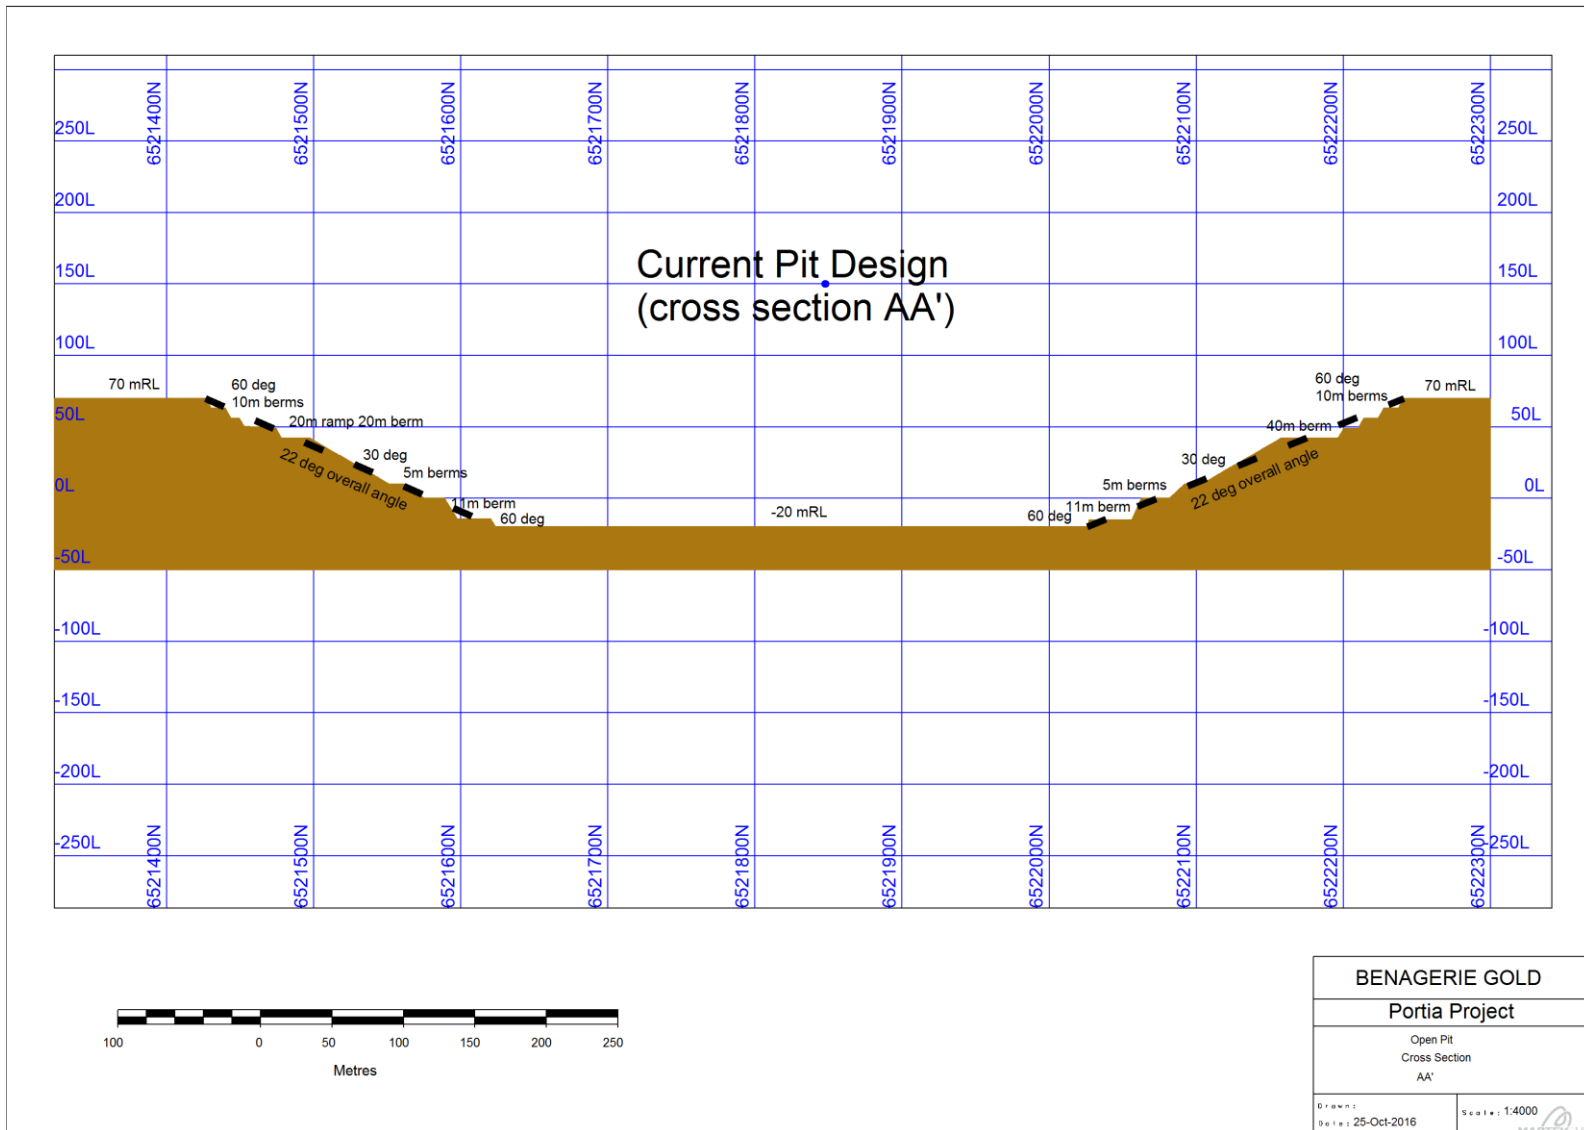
Portia Open Pit (Updated Design) Cross-Section A-A'
